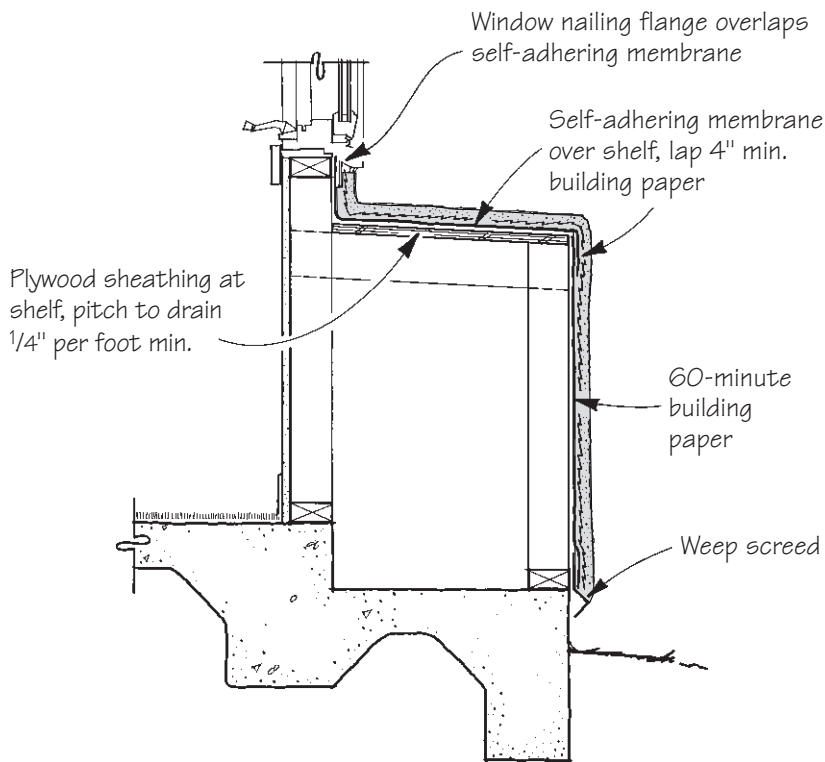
Leaks at parapets, pot shelves, and other horizontal surfaces can cause framing lumber to swell and crack the stucco. To promote drainage, the horizontal framing must be adequately sloped and should be fully flashed with a self-adhering membrane. The stepped slab also serves to contain leaks.
